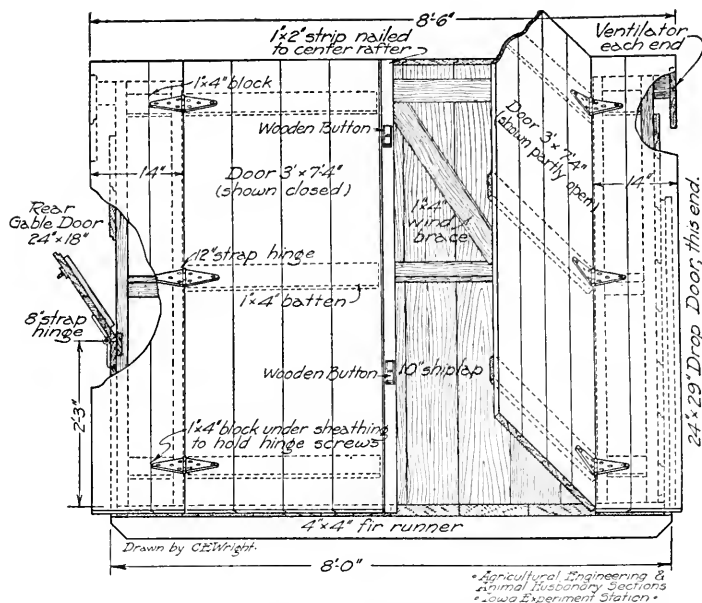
"A" House (Doors Hinged at Side). Side elevation.
